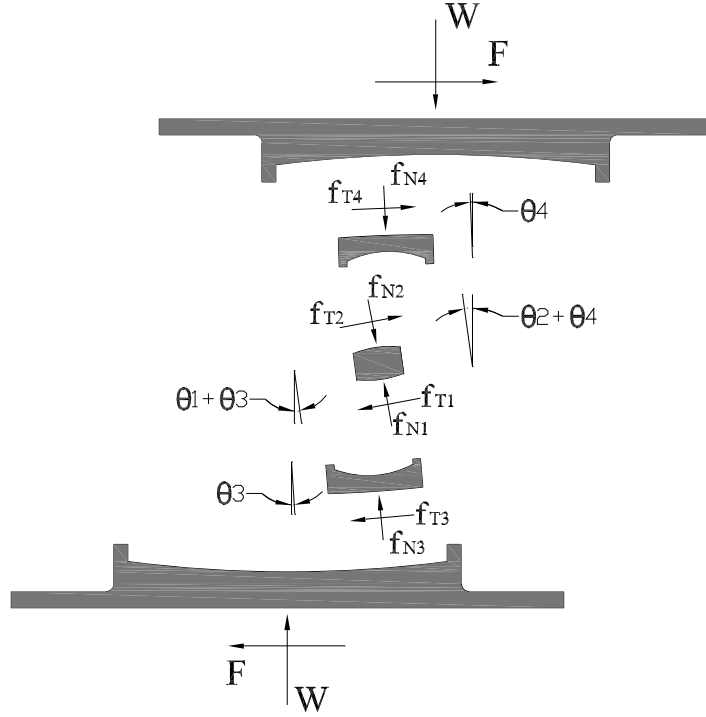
Forces in an offset triple friction pendulum bearing (exploded 1D view)
